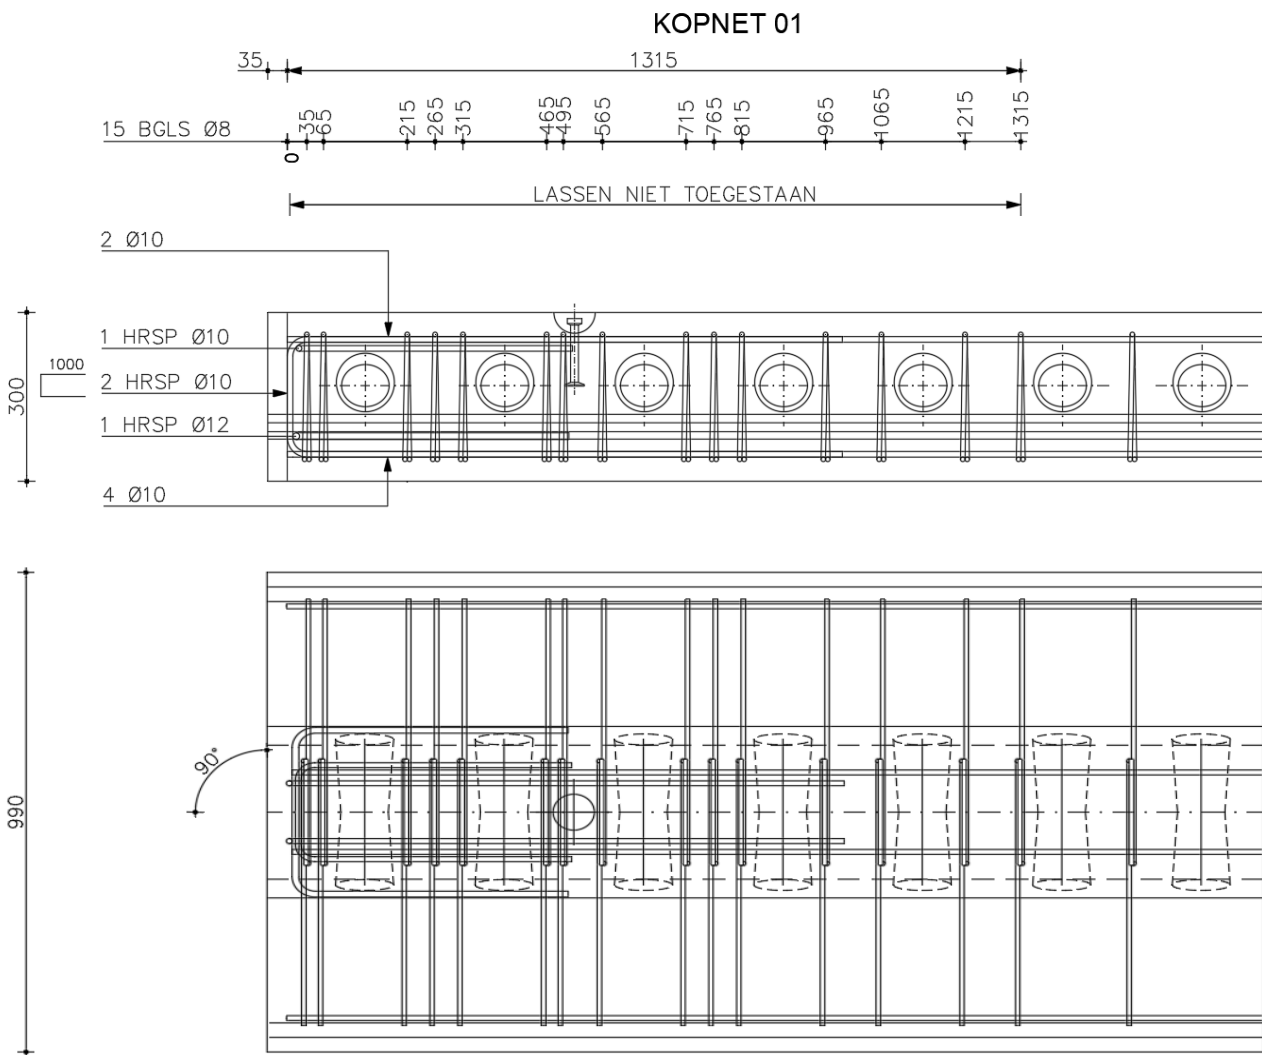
Side view, and top view of the edge of the girder, showing stirrup placements, and gaps with a spacing of 250 mm
